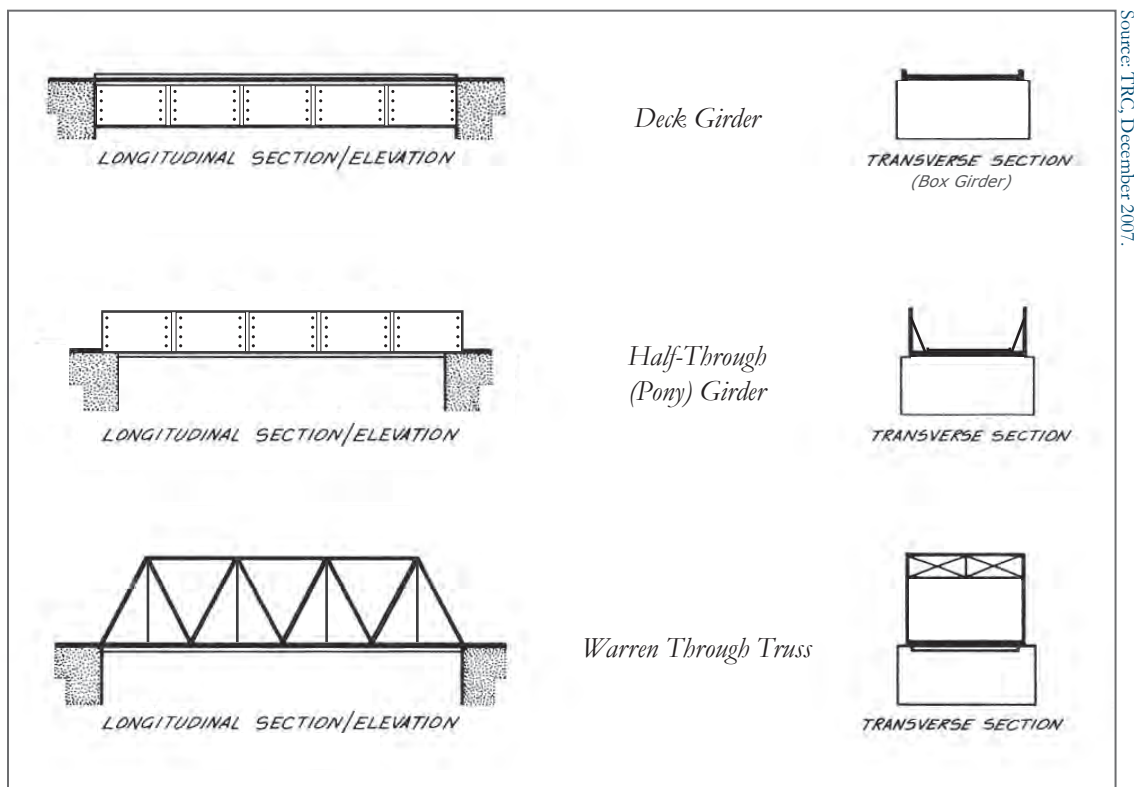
Bridge Types: Deck Girder, Half-Through Girder and Warren Through Truss.
